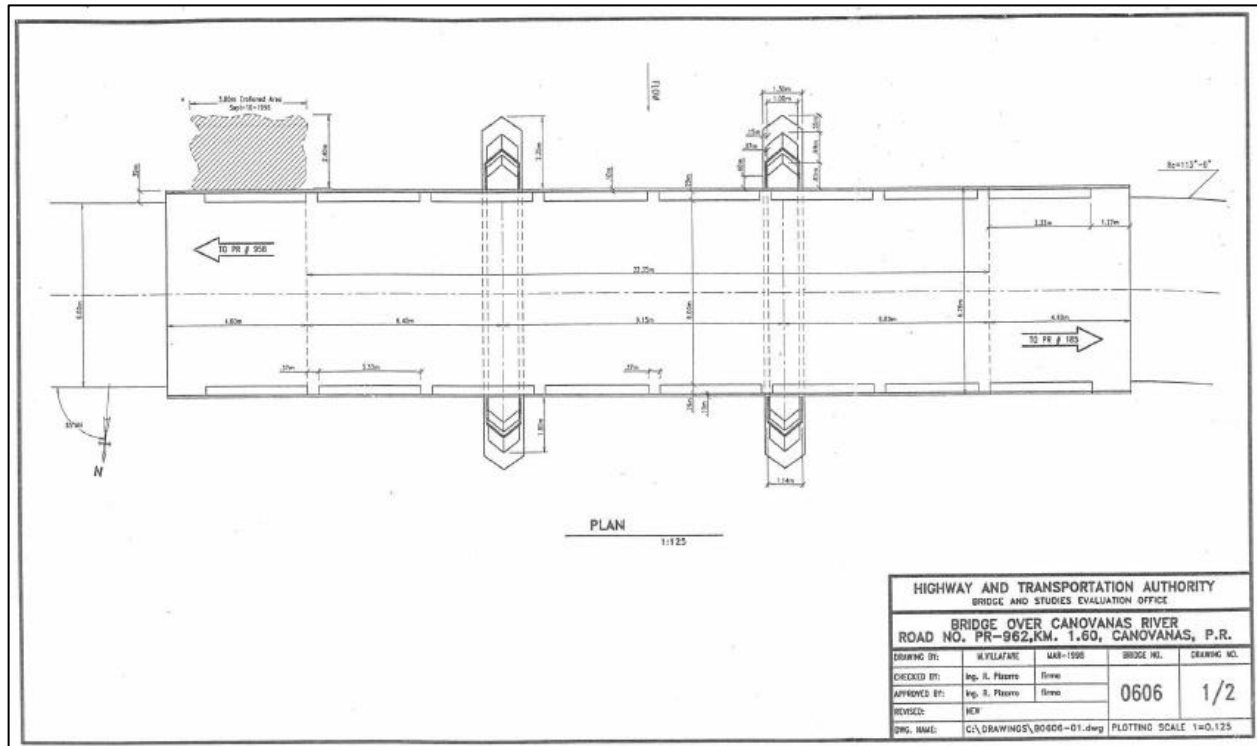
Bridge 606 drawings (source: PRHTA)
